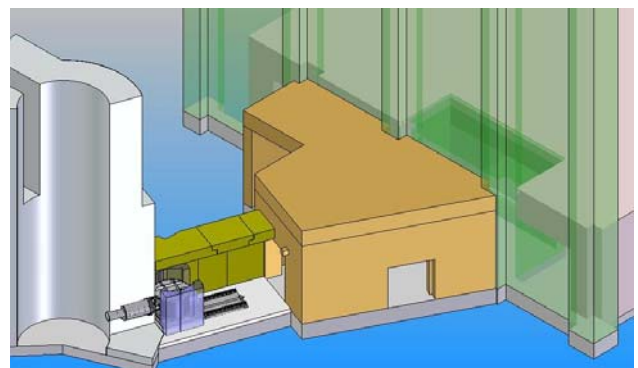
The section view of the guide shielding assembly for the primary shutter and neutron guides
